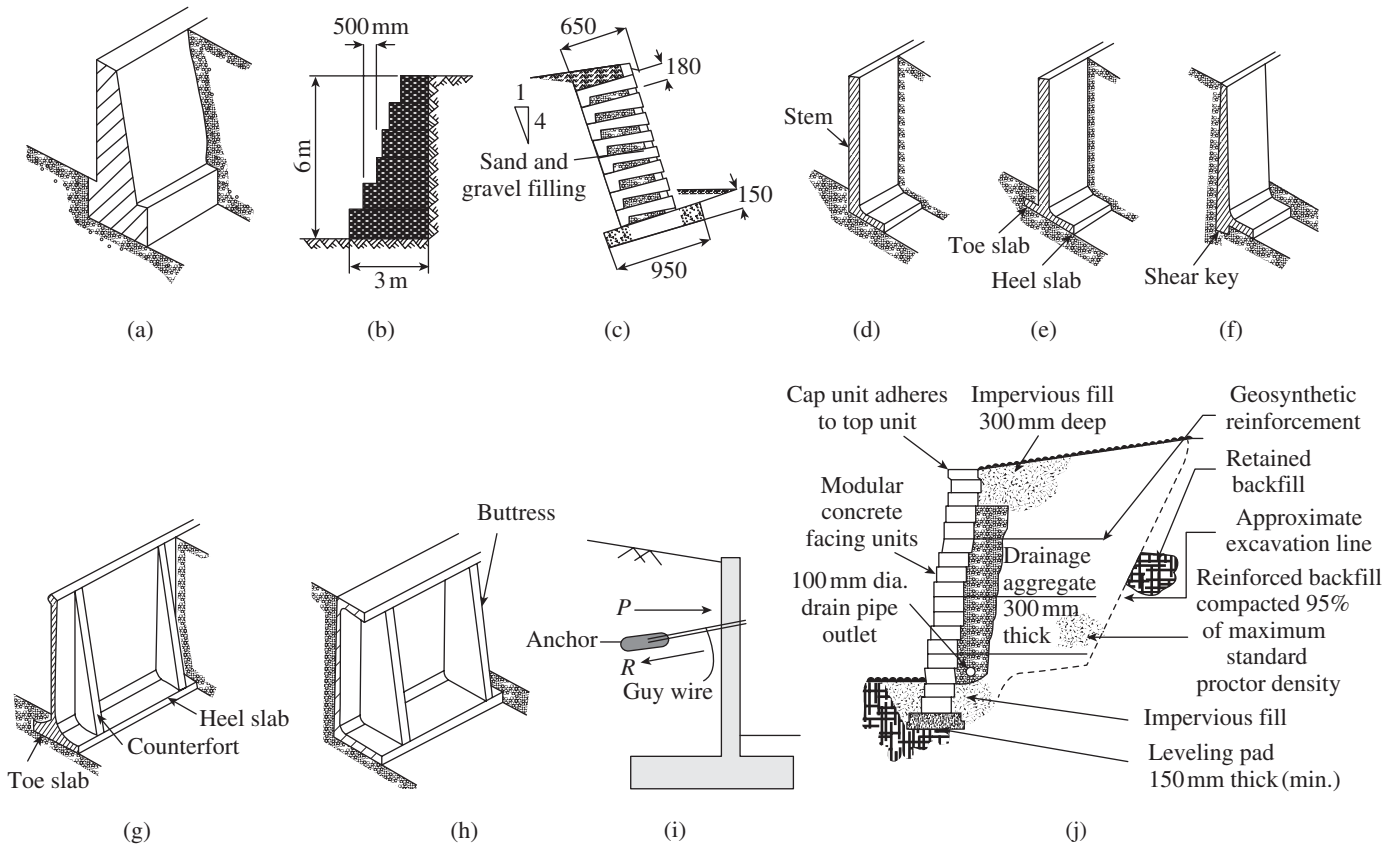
Types of retaining walls (a) Gravity (b) Gabion (c) Crib (d) T-type cantilever (e) L-type cantilever (f) L-type with shear key (g) Counterfort (h) Buttress (i) Anchored (j) Segmental
